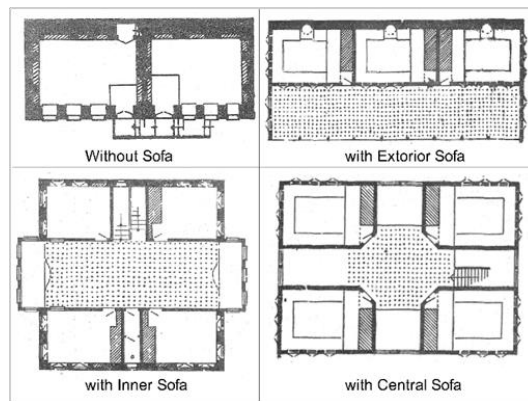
Traditional Turkish house plan types (Eldem, 1968)
